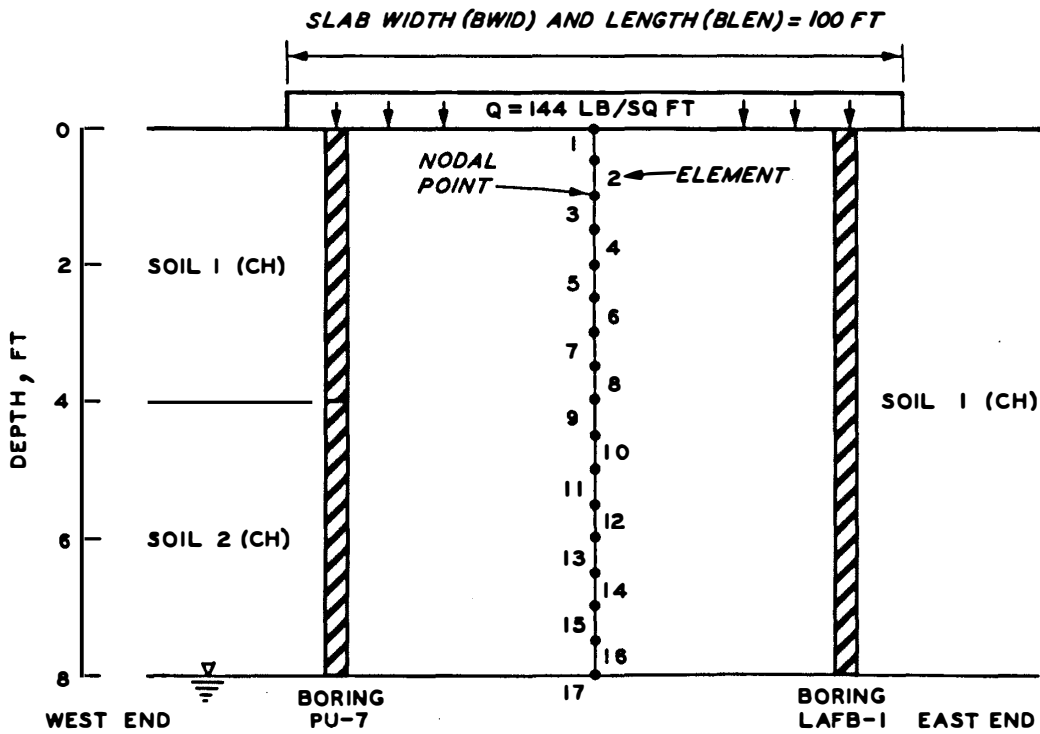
Slab foundation on ground surface with shallow water table 8 ft below ground surface
